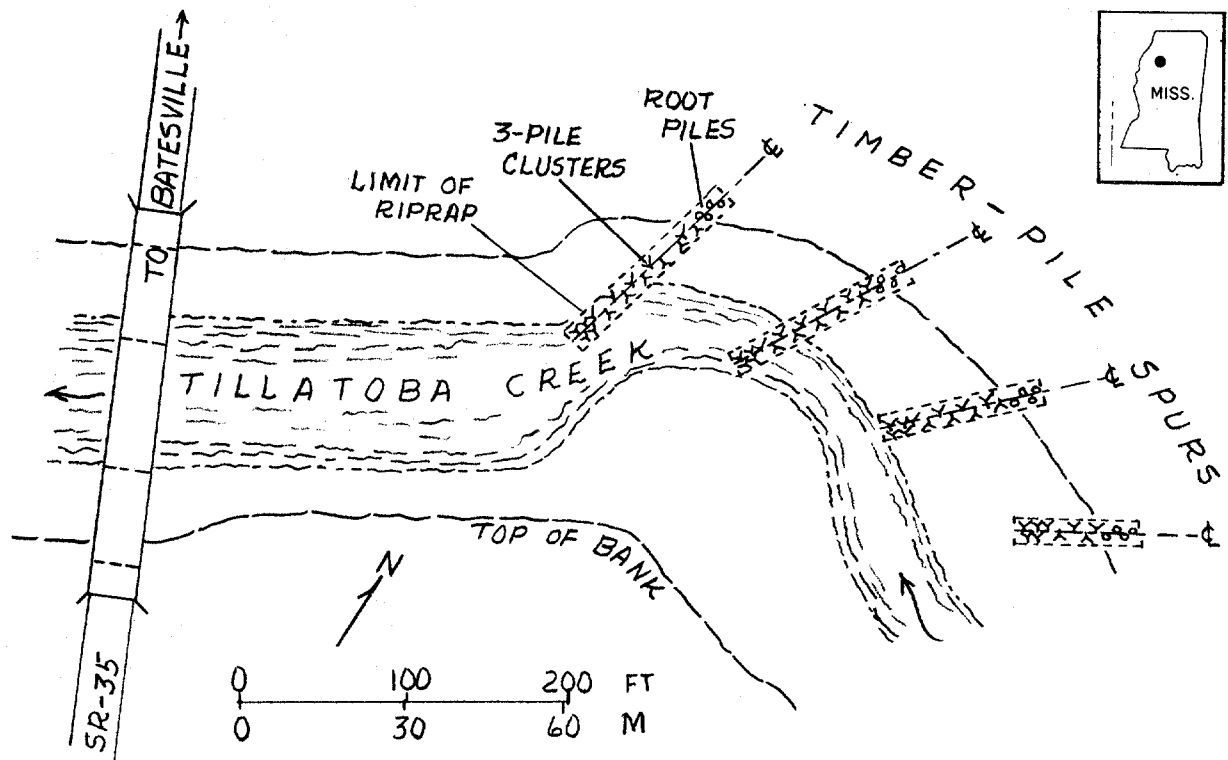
Plan sketch showing location of spurs at SR-35 crossing.
